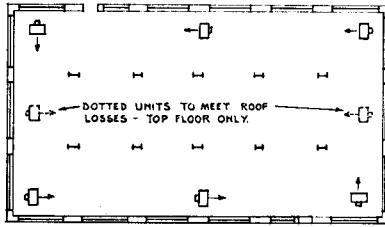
Typical installation of horizontal air discharge unit heaters on factory floor providing rotary air motion around walls.
